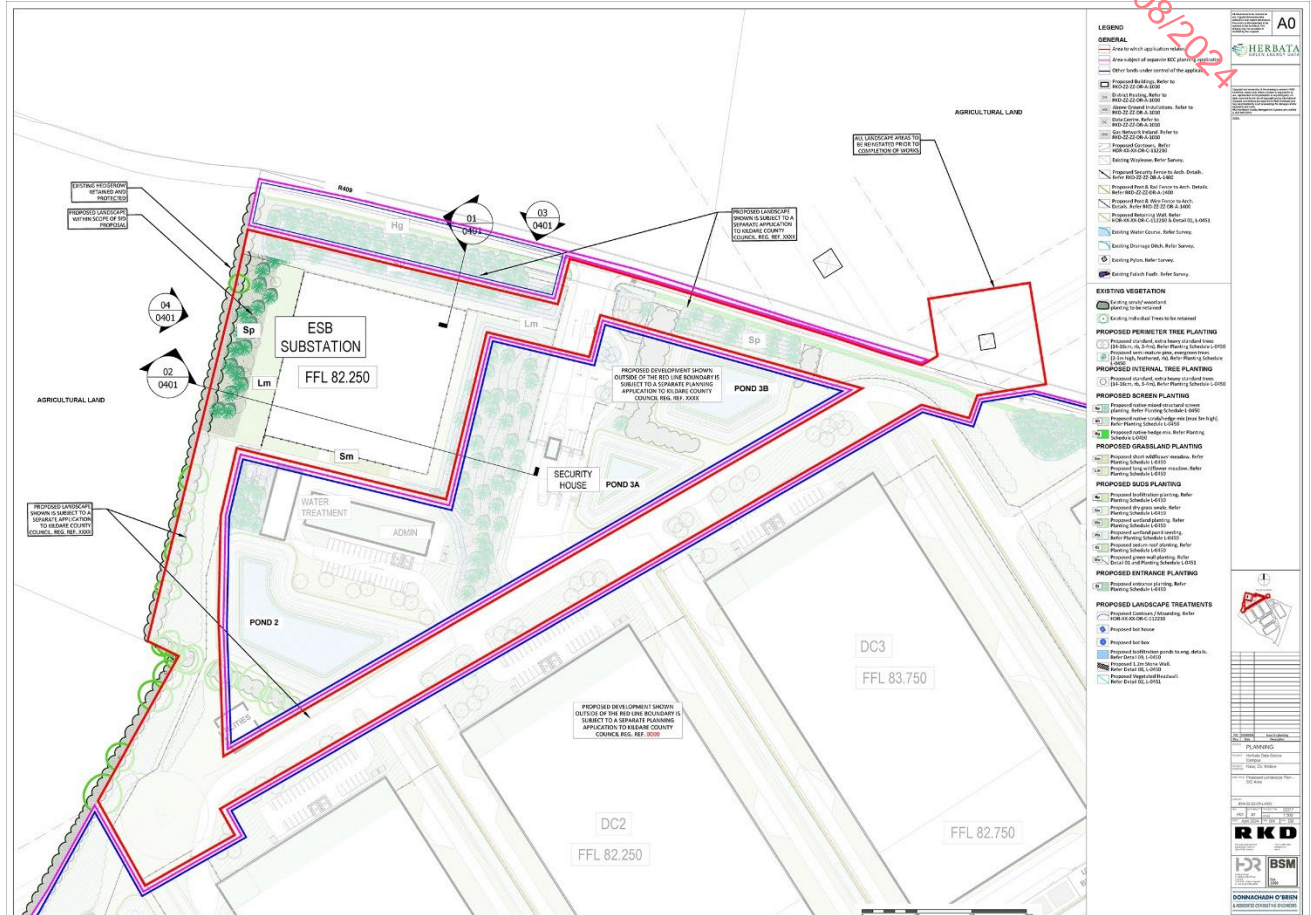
Landscape Plan to Substation Refer drawing BSM-ZZ-ZZ-DR-L-0302_LandscapePlanSID
